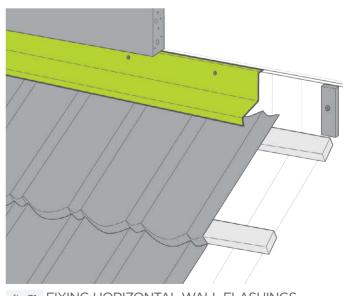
FIXING HORIZONTAL WALL FLASHINGS WITHOUT BENDING TILES VERSION
